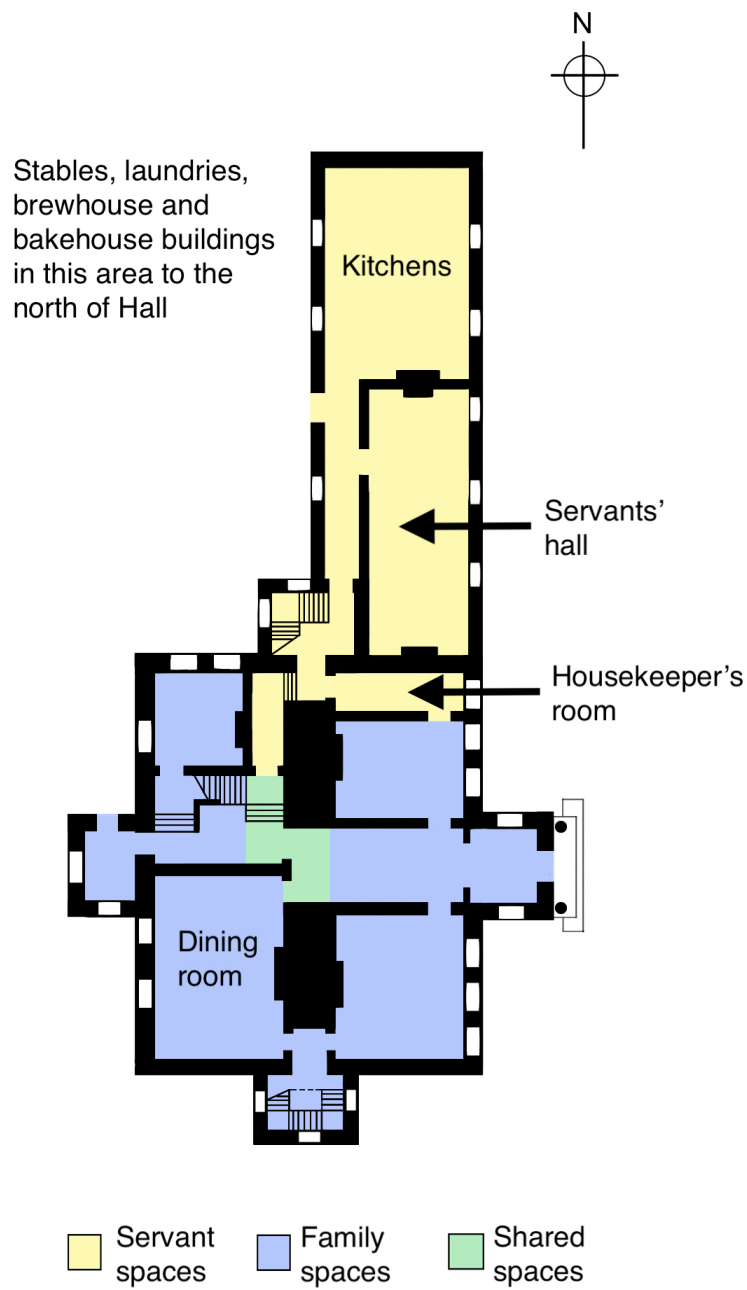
Kiplin Hall c1740 Phase 1 ground floor plan
